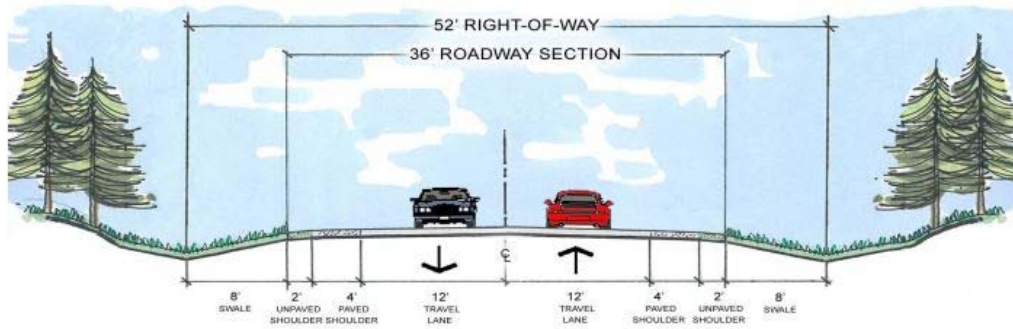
Rural 2-Lane Collector Section (Southwest Area Plan)
